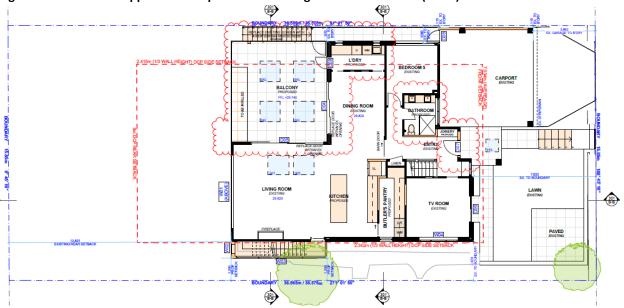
Extract from Modification Plans showing Ground Floor Level (MOD04)
